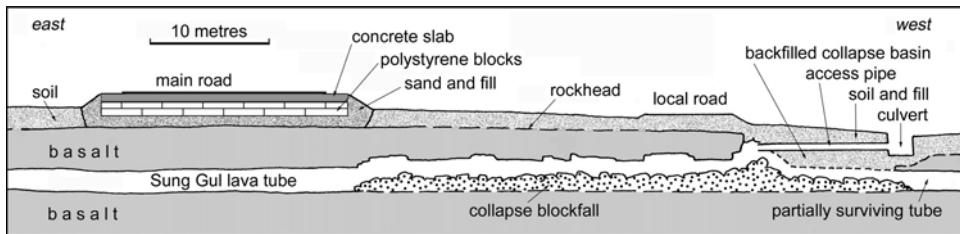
Sketch profile along the lower part of Sung Gul; the tube has an unbroken roof where it passes beneath the road, but has extensive breakdown down-flow of the road as far as the zone of total collapse, through which lies the access pipe.
